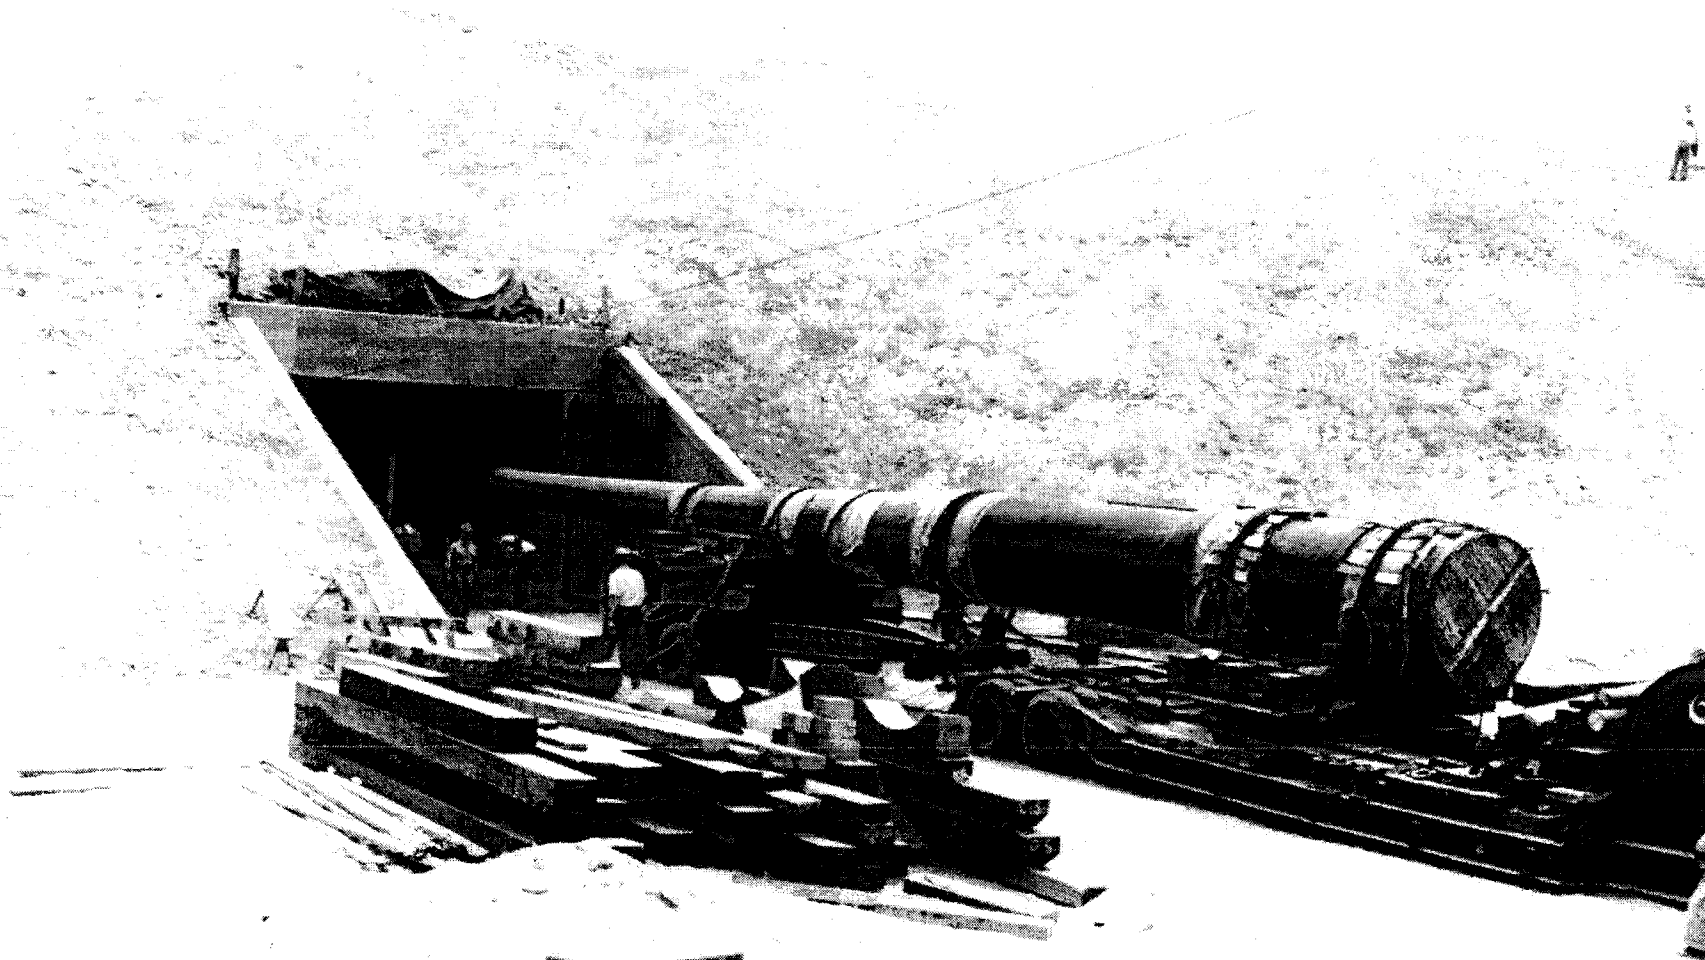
Construction of 16-inch Gun at Battery Number 4 (#121), 1943
